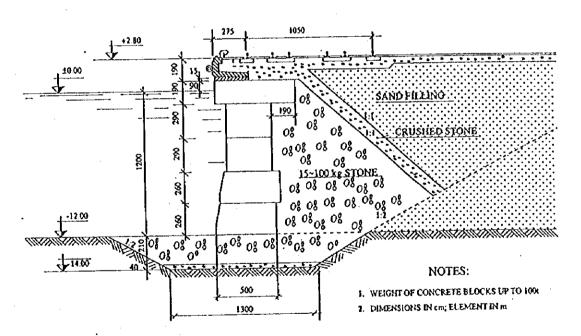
Standard Cross Section of Quay Block Type (-12.0m)
